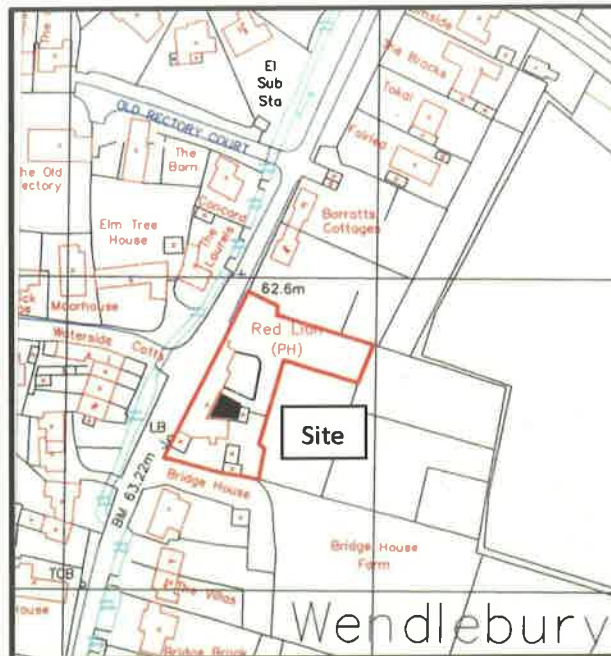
Site Location Plan – reproduced under licence WL 1005534
